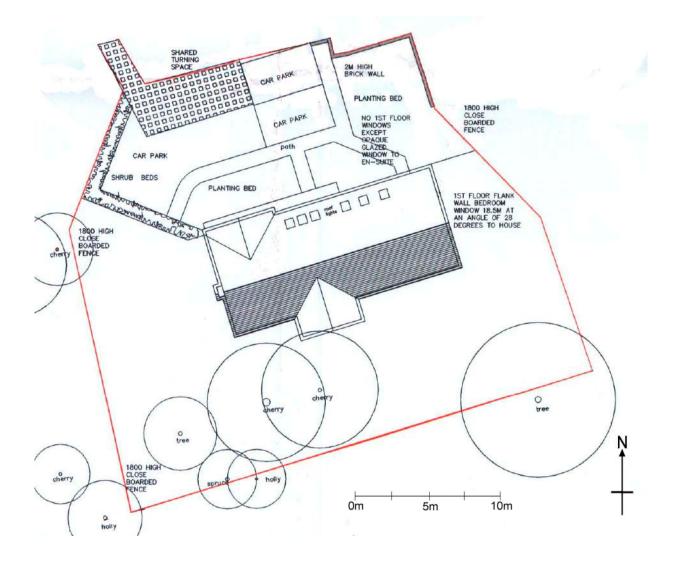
Proposed site plan of the development with the new building in the approximate centre
